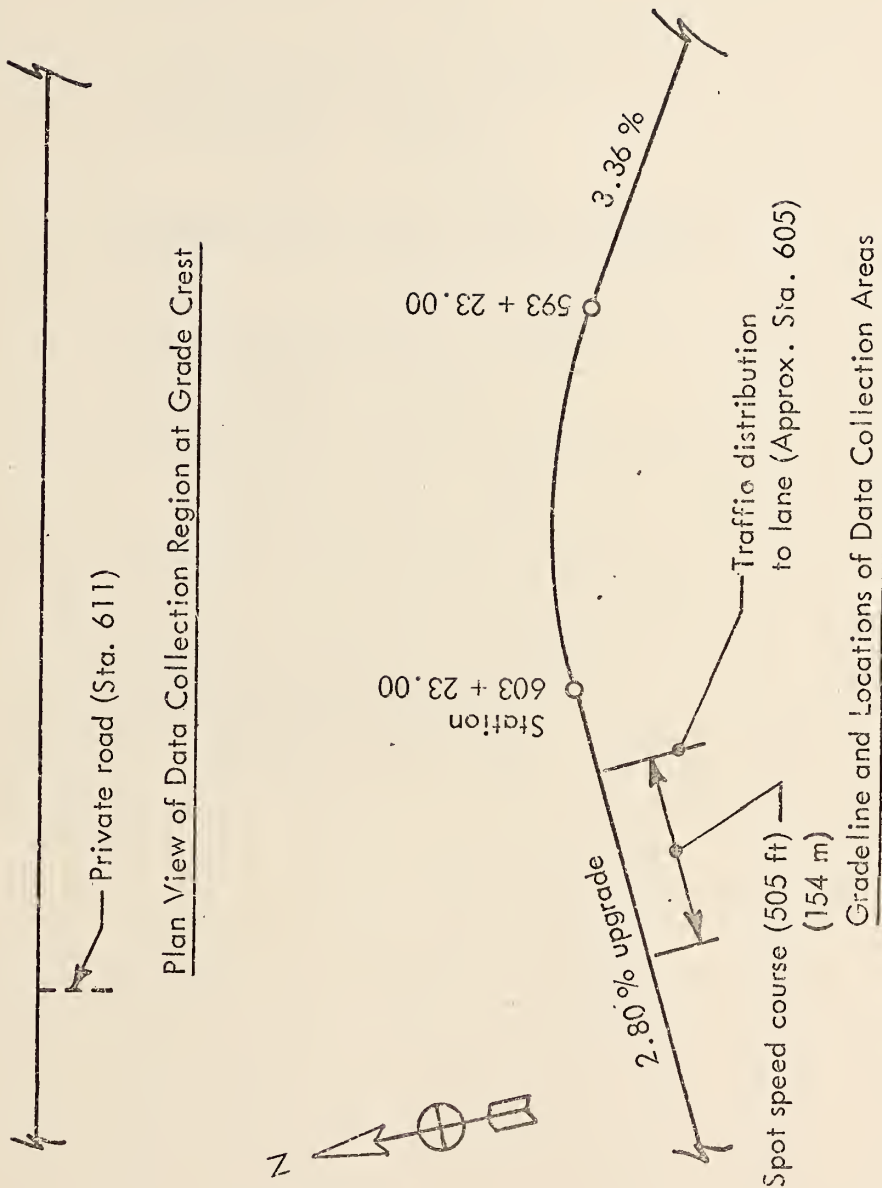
I-580 Data Collection Location at Grade Crest, Site 1-3
